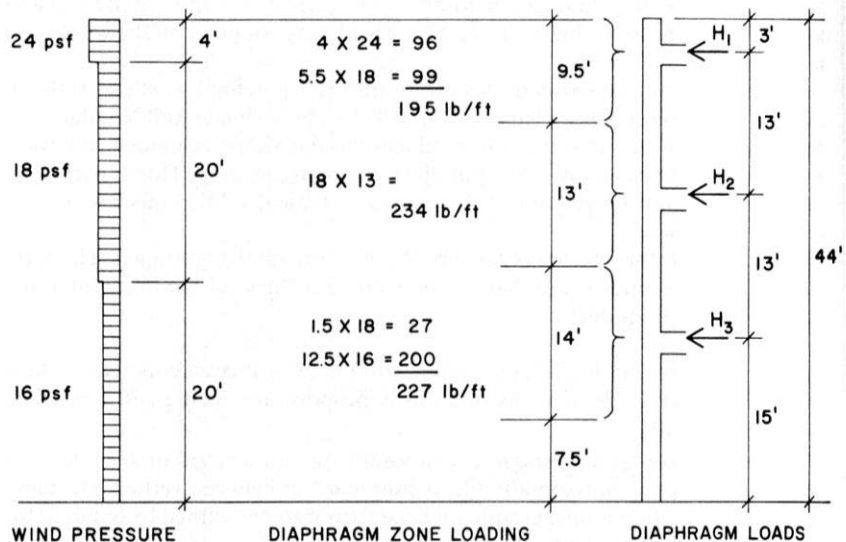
Building Five: How wind loads affect the lateral bracing system.
